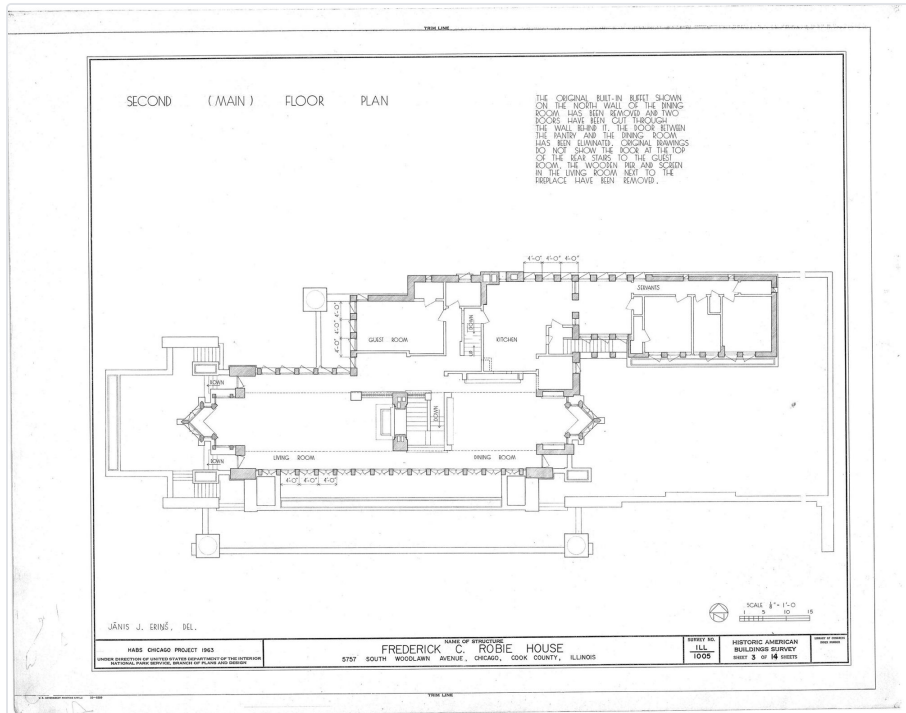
The same house in plan: the second (main) floor of the Robie House, from the same 1963 survey. A plan tells you where every wall and window is, but not what the wall is made of, what it costs or what passes through it.
